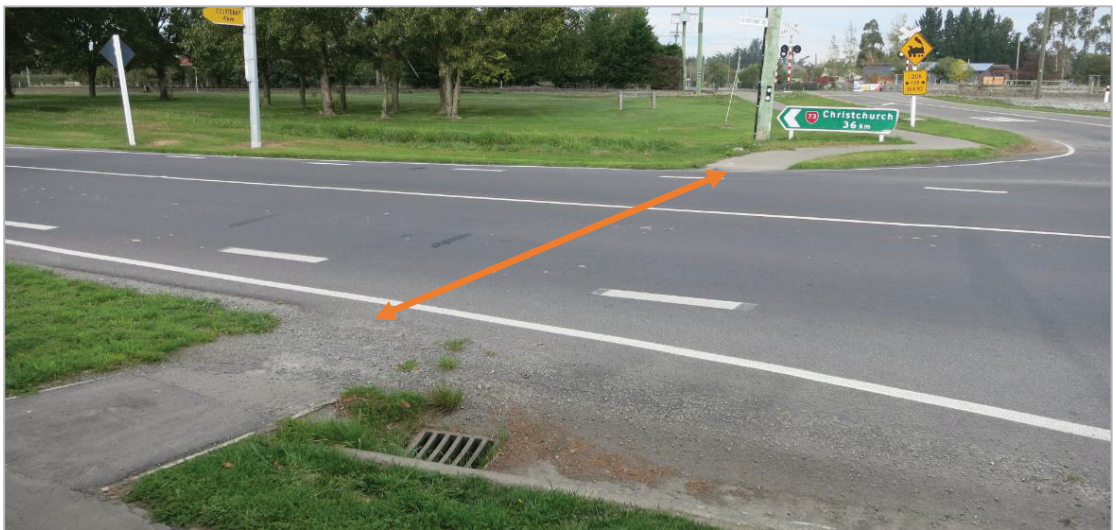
View of SH77 / Courtenay Road Intersection Looking East on SH73
